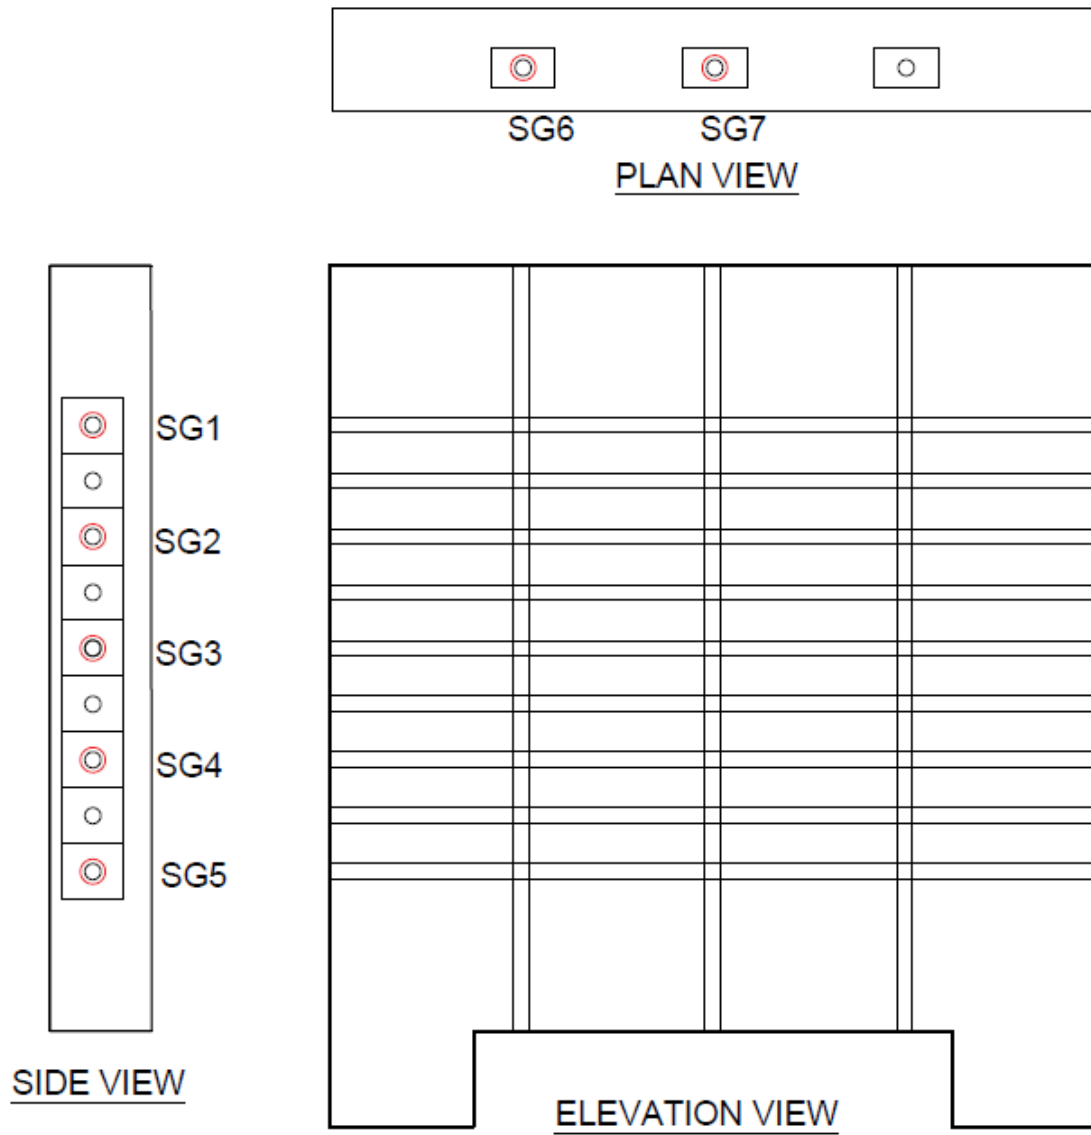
Specimen 1- Post-Tensioning Bar Strain Gage Labels and Locations
